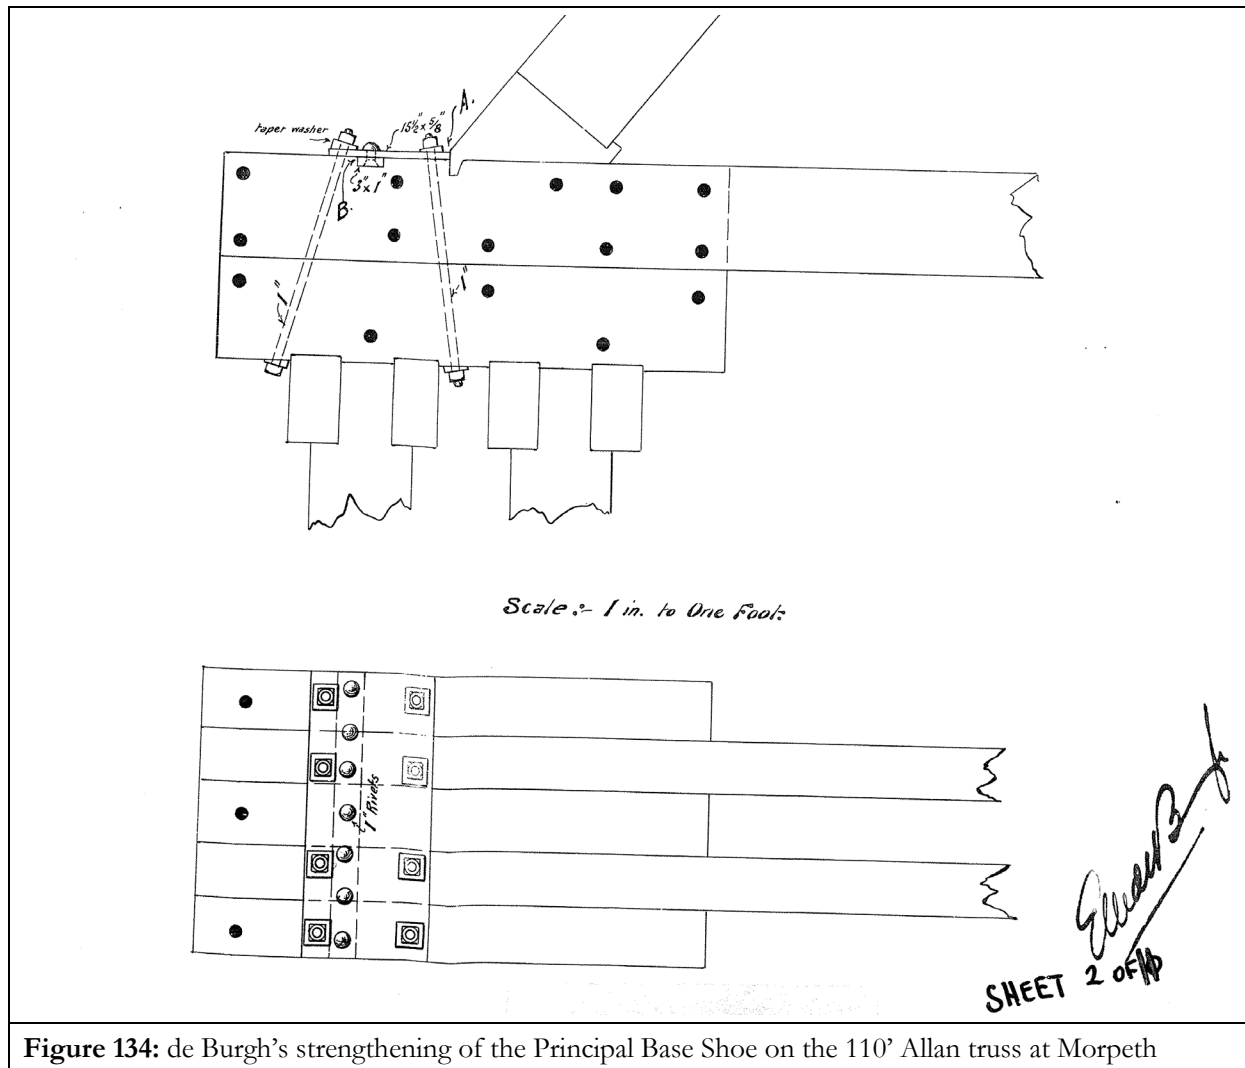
de Burgh's strengthening of the Principal Base Shoe on the 110' Allan truss at Morpeth
